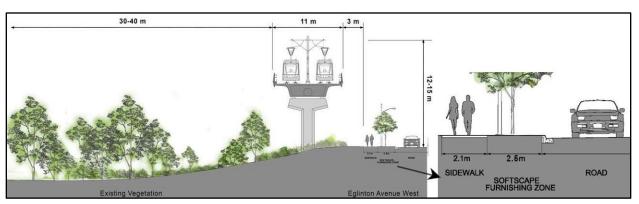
Elevated Guideway Single-Pier Configuration (West of Jane Street, Near Emmett Avenue)
